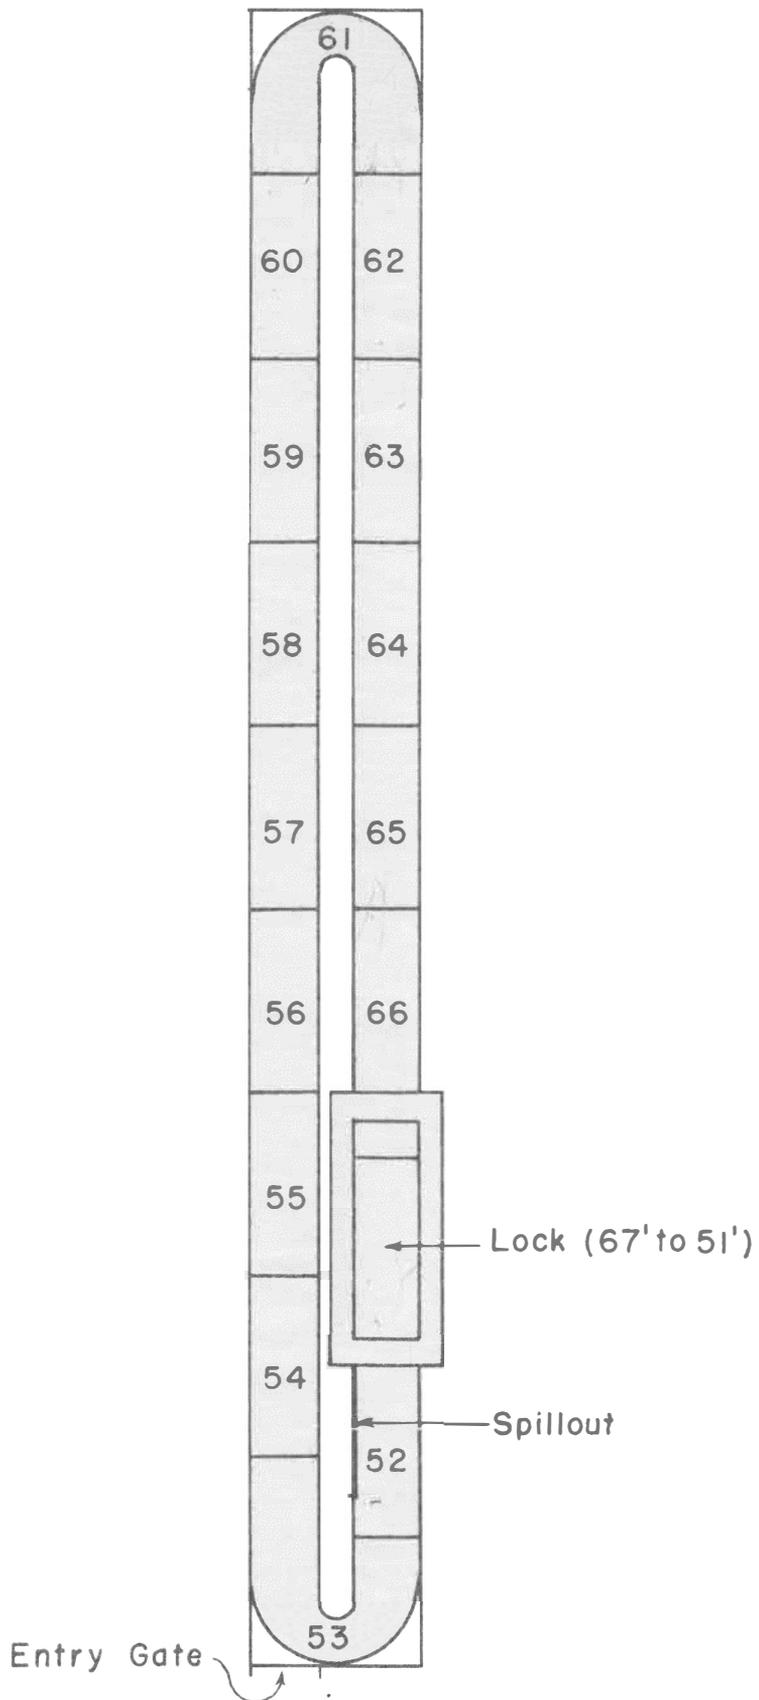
Plan view of 1 on 8 slope fishway showing pool elevations in height above mean sea level.
